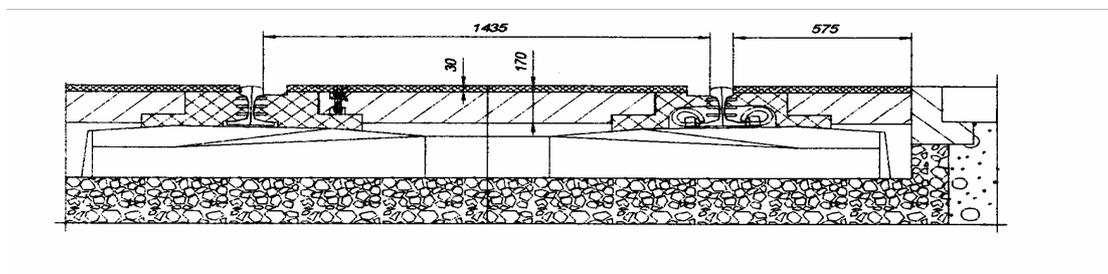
Prefabricated concrete slab covered in elastomer anti-slide layer
